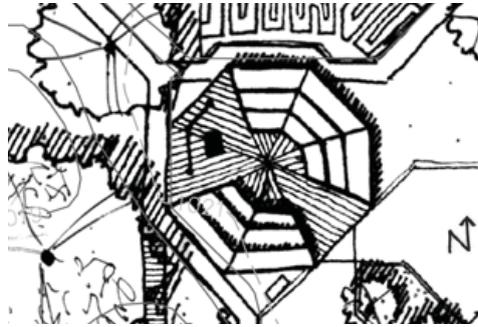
Enlarged Plan of Large Outdoor Classroom. Not to Scale. Plan by Author
